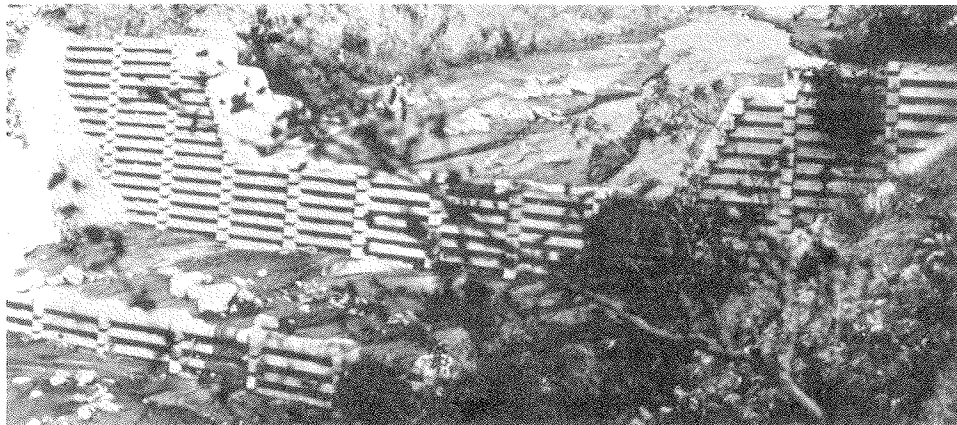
Debris dam of precast concrete sections fabricated to enable placement in interlocking fashion.
